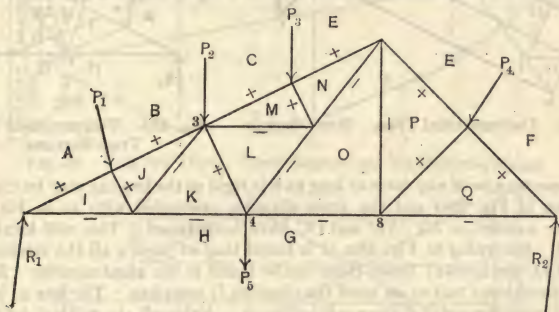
B. Unsymmetrical Truss. Truss-diagram
